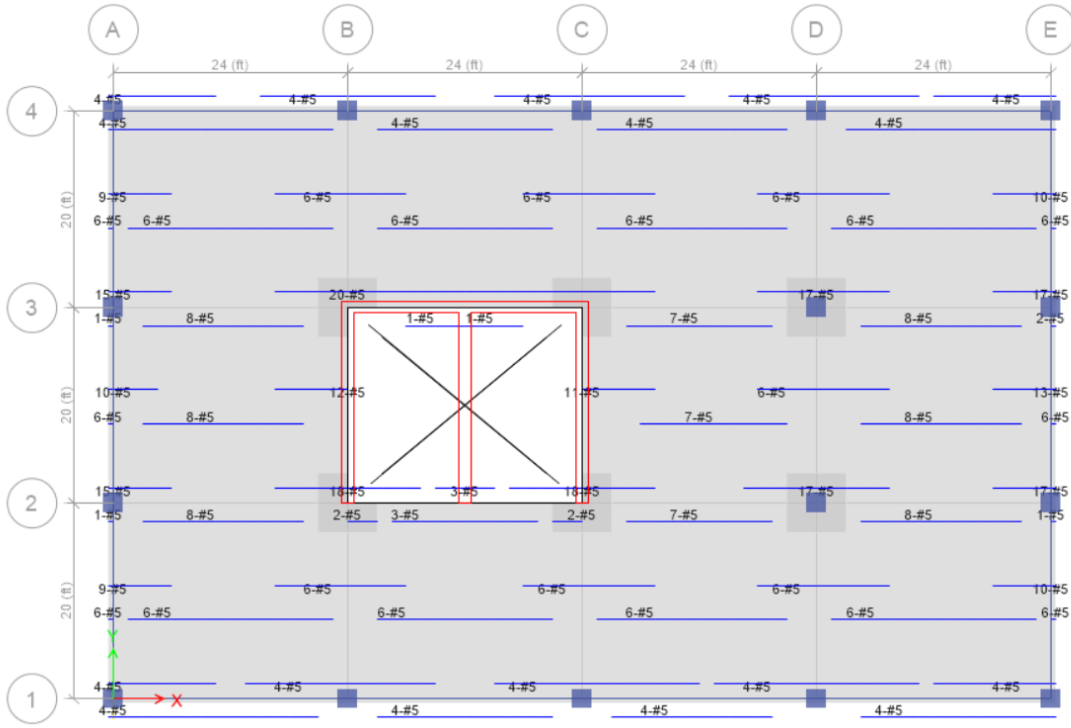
Reinforcement information for top and bottom rebar for layer A of slab
